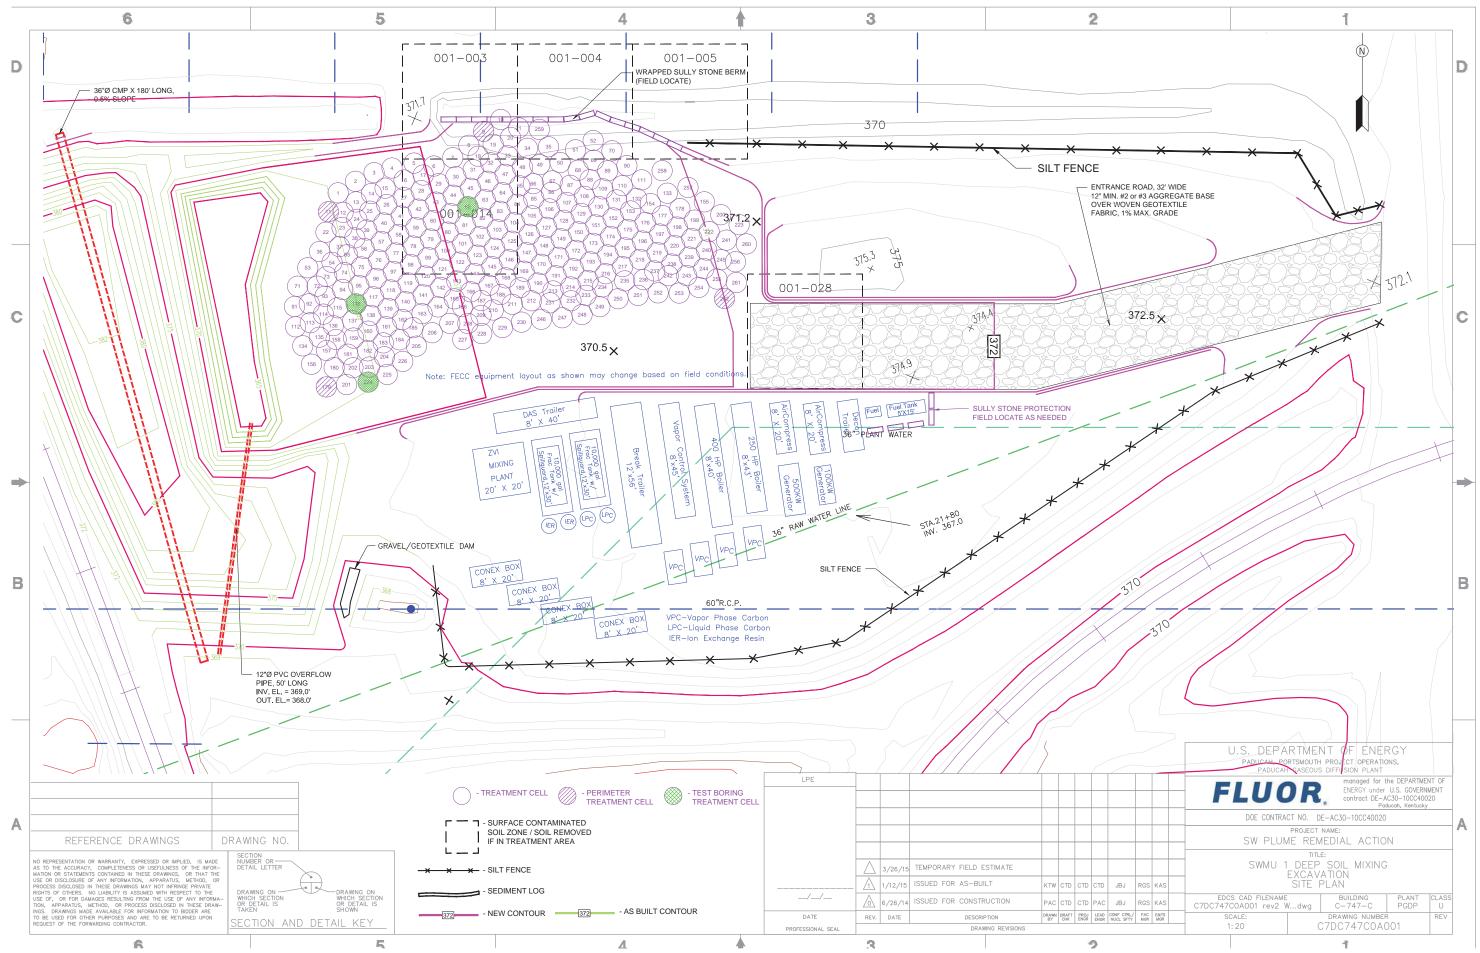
SWMU 1 As-Built after Soil Excavation and Planned Layout of Soil Mixing Columns and Support Equipment
